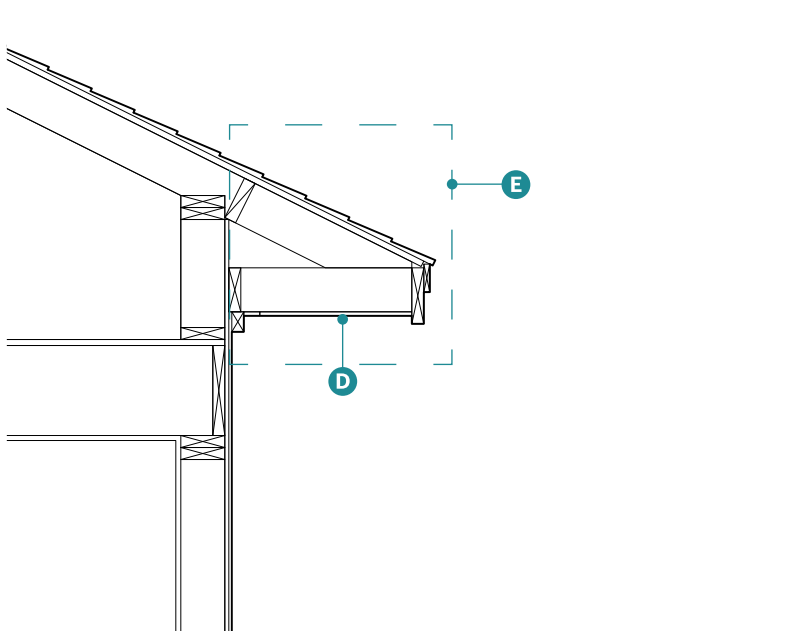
Section Detail of Highest Eave for Pitched Roof
